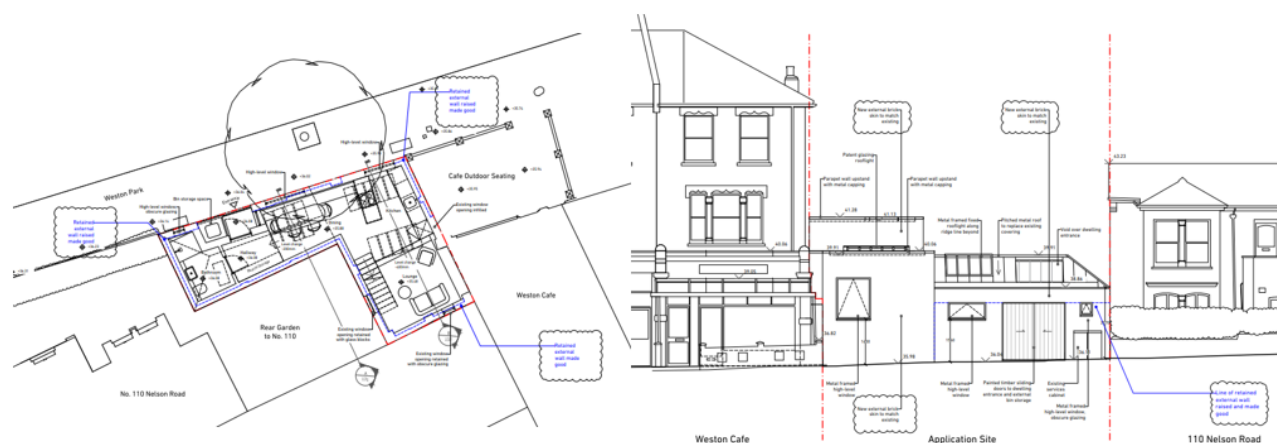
Proposed ground floor plan and north elevation (courtesy, Brown Urbanism 2026)
